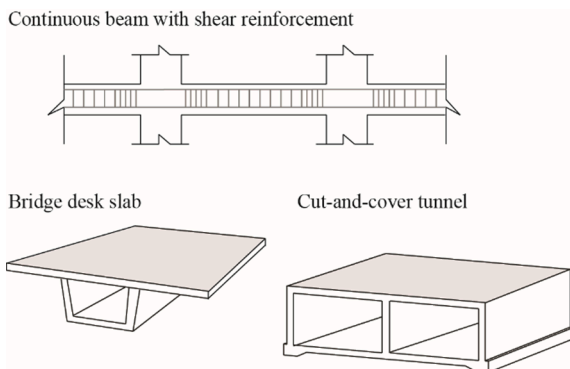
Examples of reinforced concrete statically indeterminate structures with and without shear reinforcement: continuous beams, cantilever slabs and redundant planar members.
